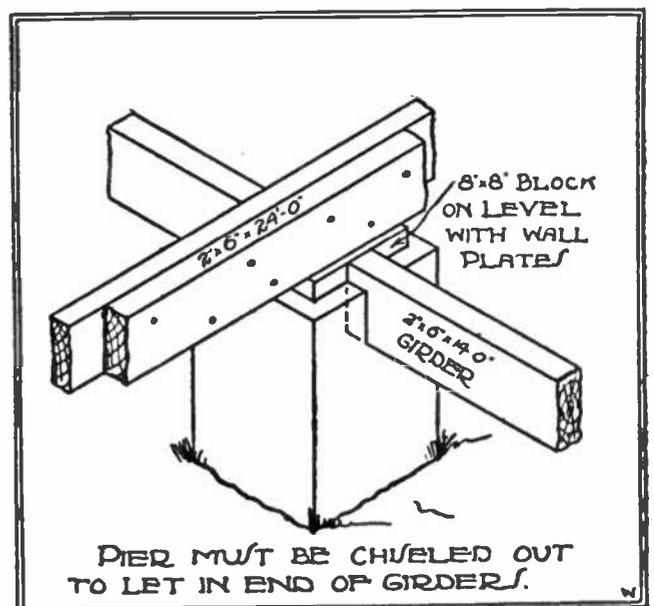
Detail of Construction at Center Piers *E* and *F*.
